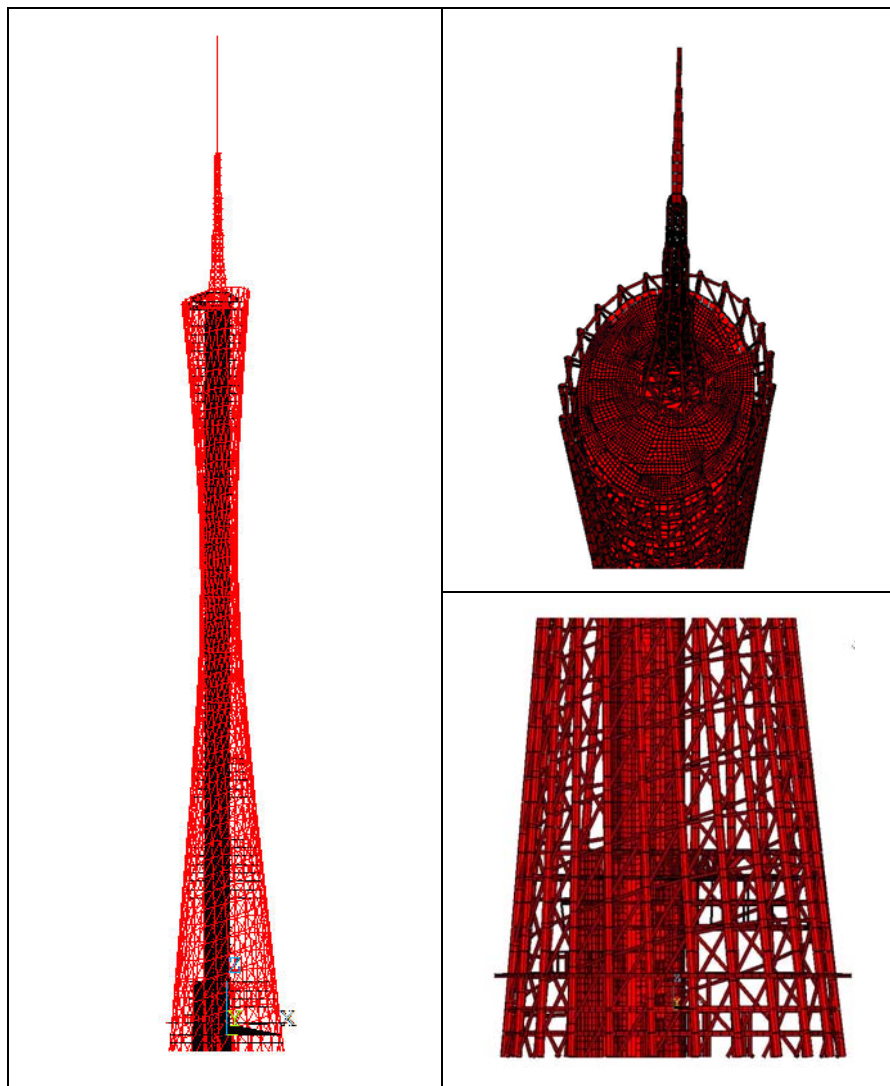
3D model of Guangzhou New TV Tower in ANSYS
